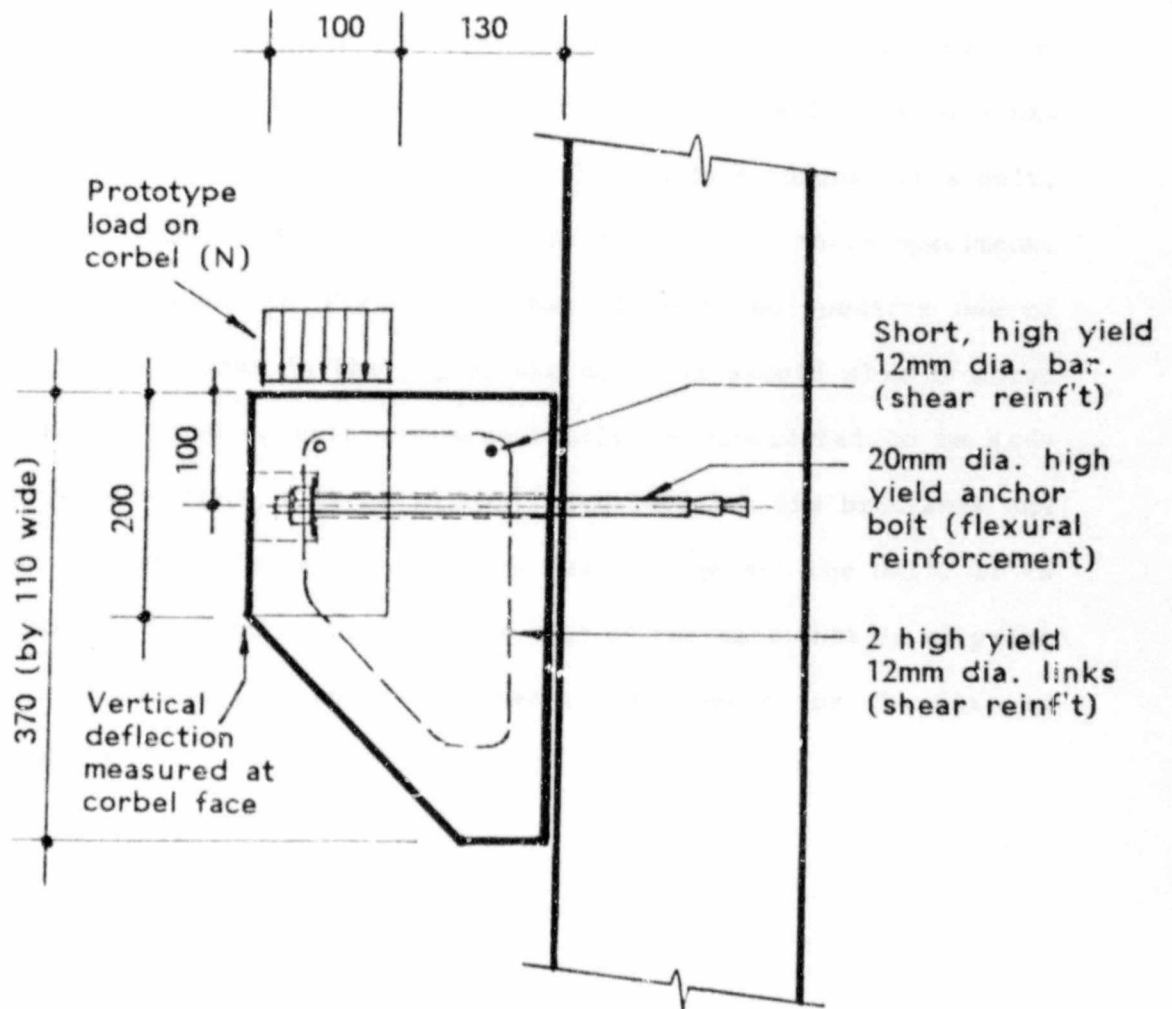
DETAIL OF A SINGLE LEG OF THE PRECAST BOLT-ON SPECIMENS TESTED.
